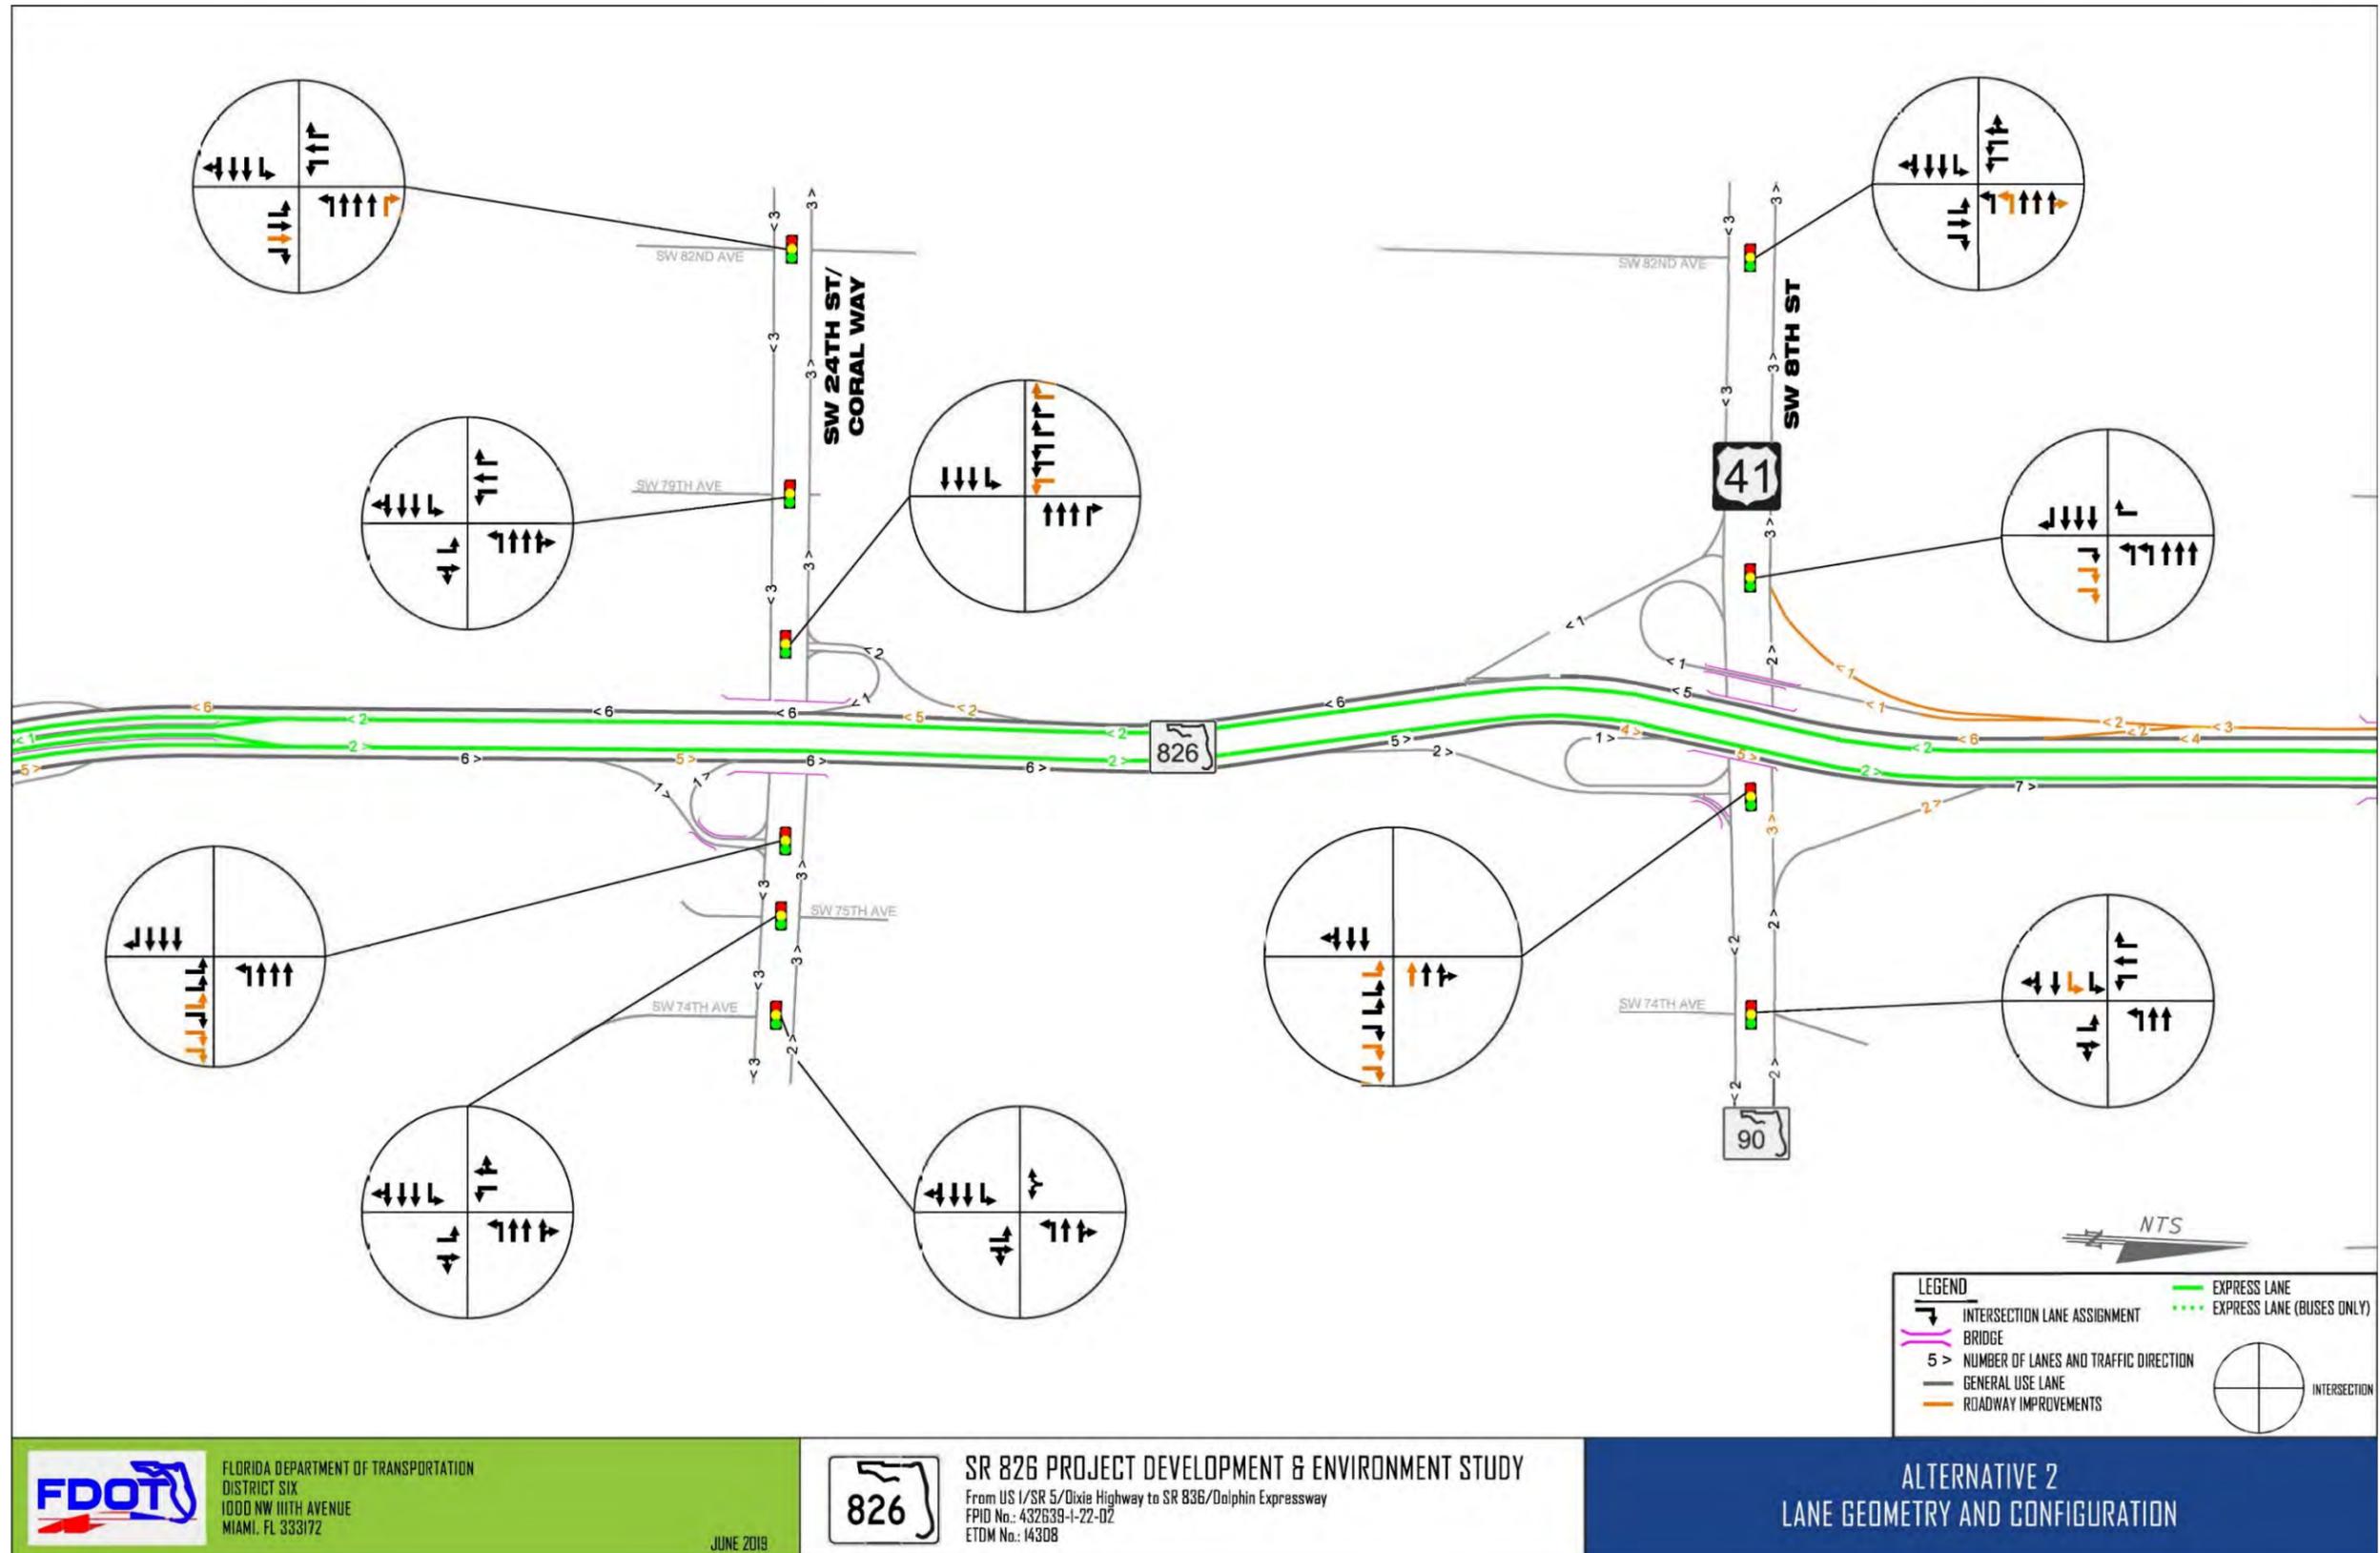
Preferred Alternative Lane Geometry and Configuration from South of SW 24th Street/Coral Way to North of SW 8th Street
